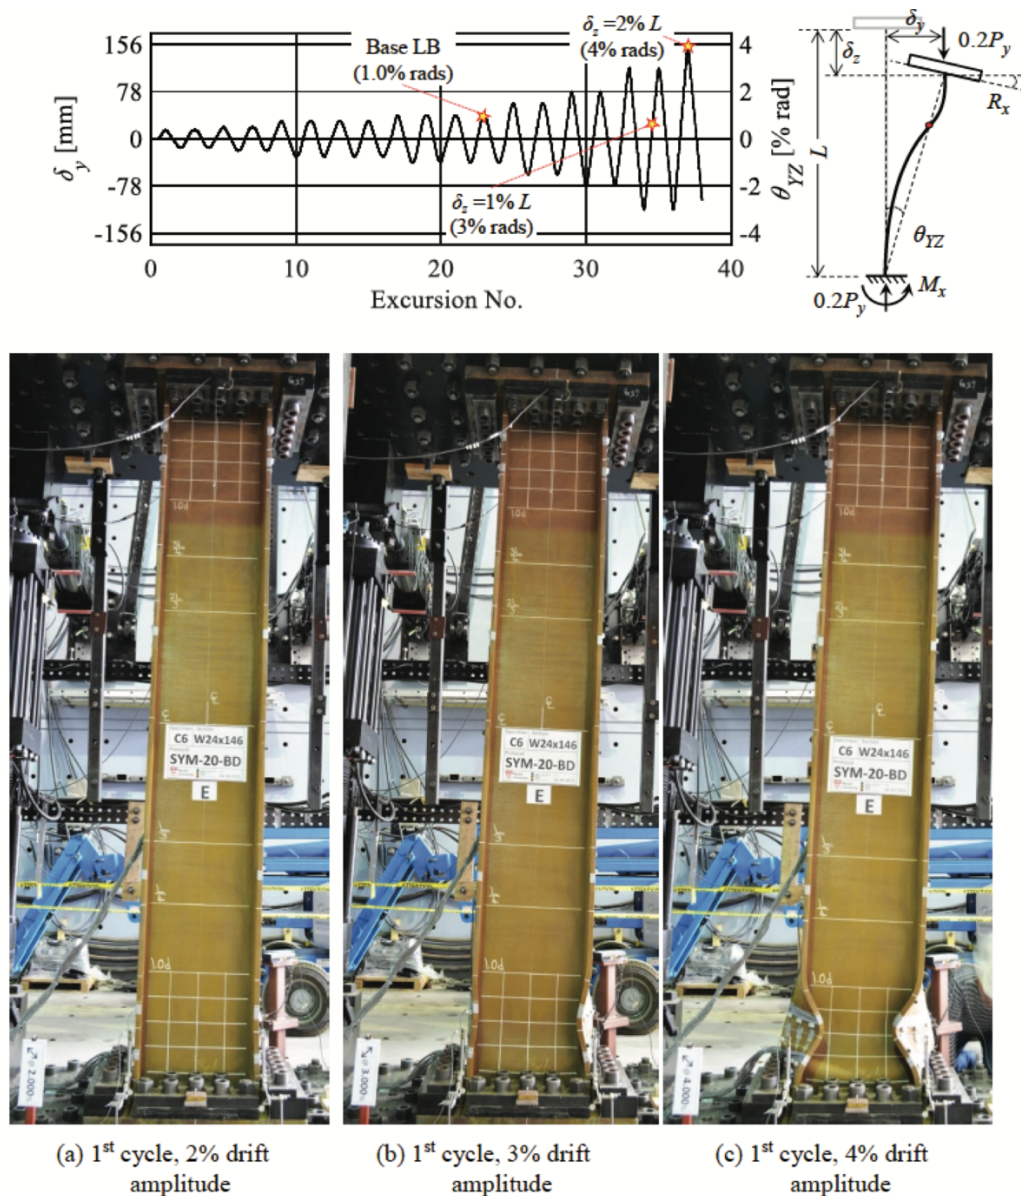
Damage progression of steel MRF columns under cyclic loading (image adopted from Elkady and Lignos 2018a)
